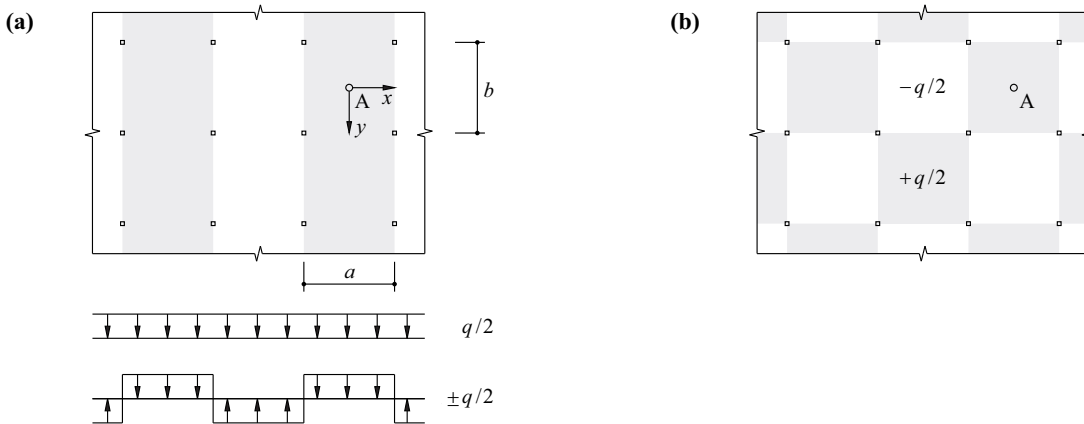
Flat slab with strip- or chessboard-type loading
